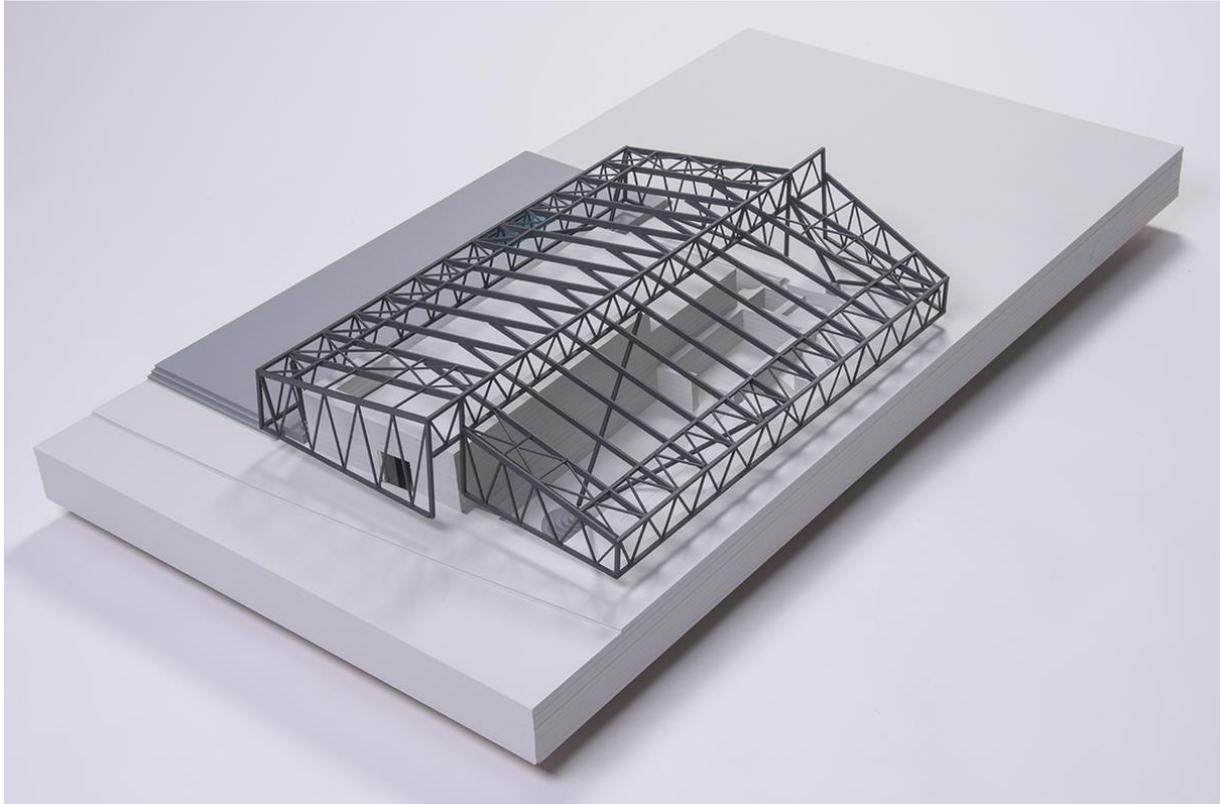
Year 4 CENV6160 Scale model showing the site and proposed structural frame and ground slab.
